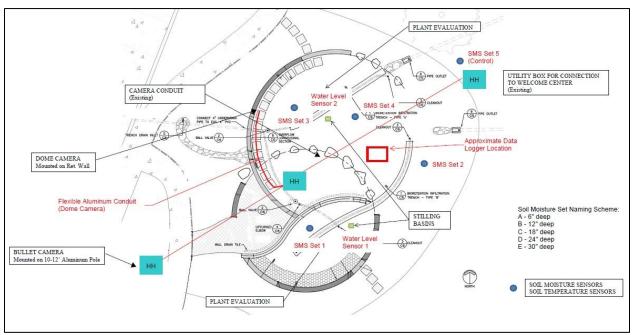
A. Site plan for UNO bioretention system monitoring equipment.
